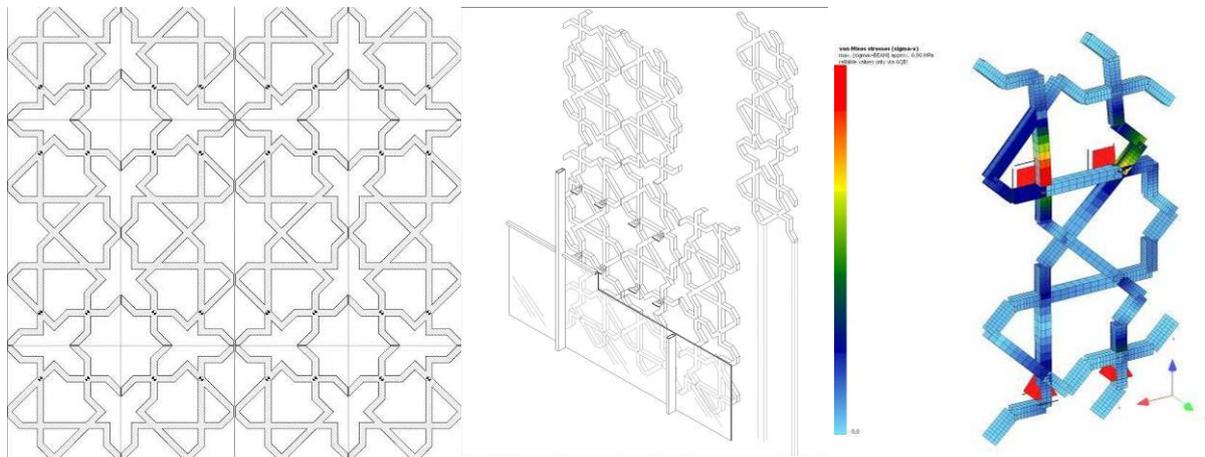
Basic pattern and assembly principle [Drawings C&E Ingénierie]
